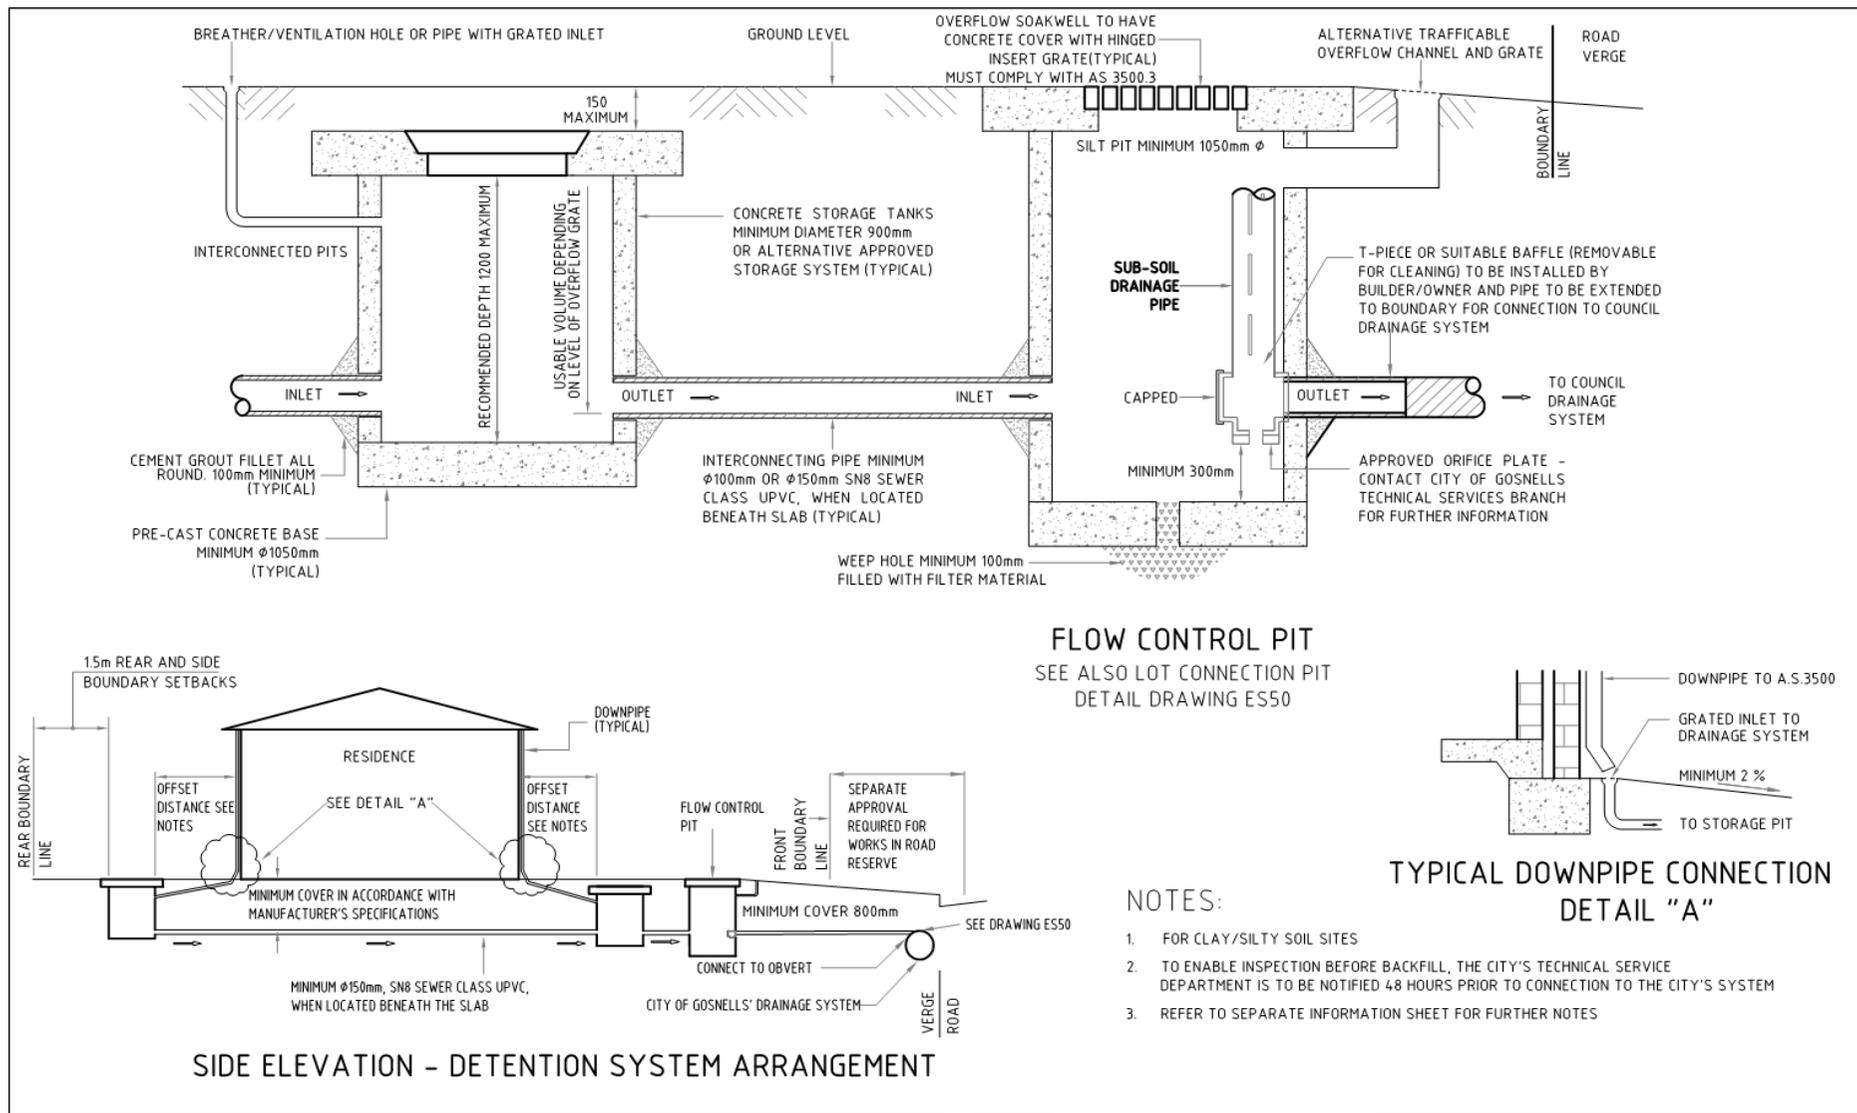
11 – Details of inter-connected circular concrete tanks and flow control pit in low-permeability site
